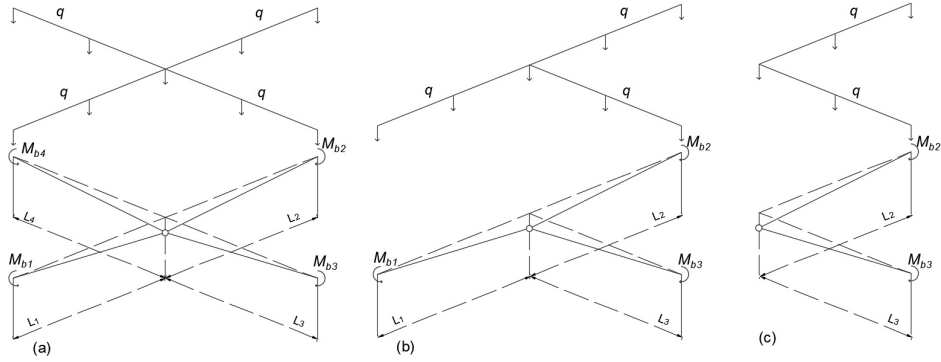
Tie mechanism for a) internal, b) border and c) corner column failure locations from Chinese code CECS 392:2014 [47]
